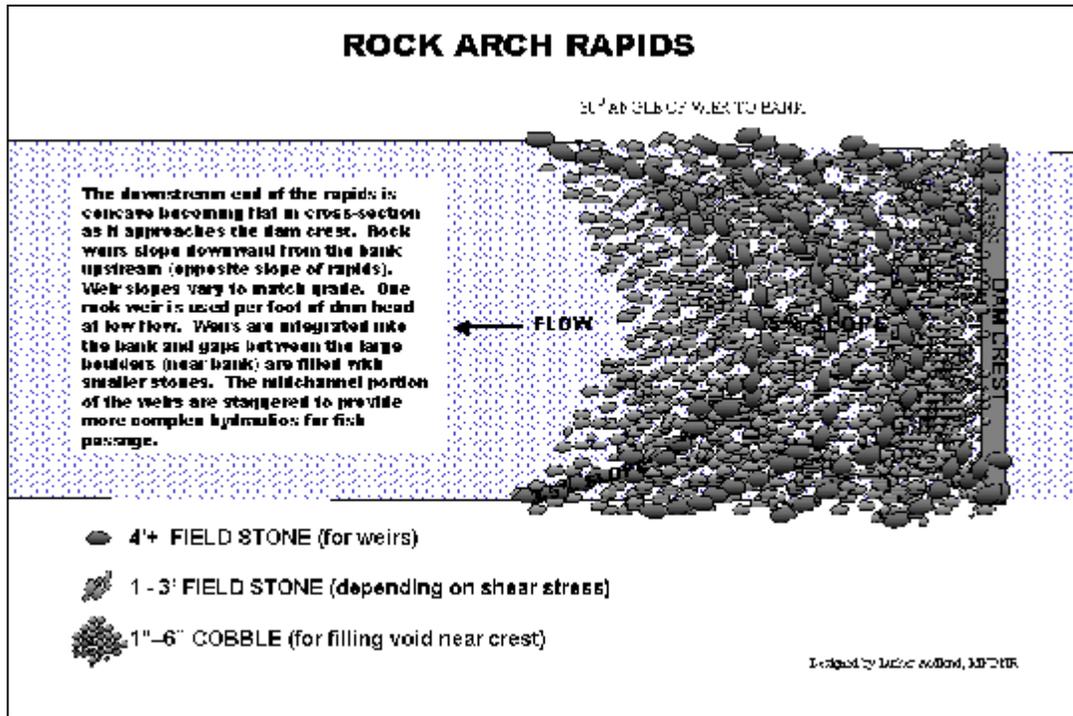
Plan view of a typical rock slope rapids used to modify a dam for fish passage. (provided by Luther Aadland MN DNR)
